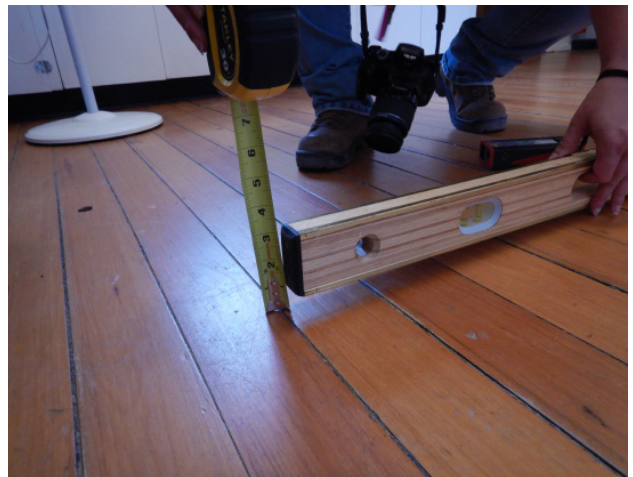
D-47 First floor in the northwest quadrant of the dwelling slopes down to the west.
